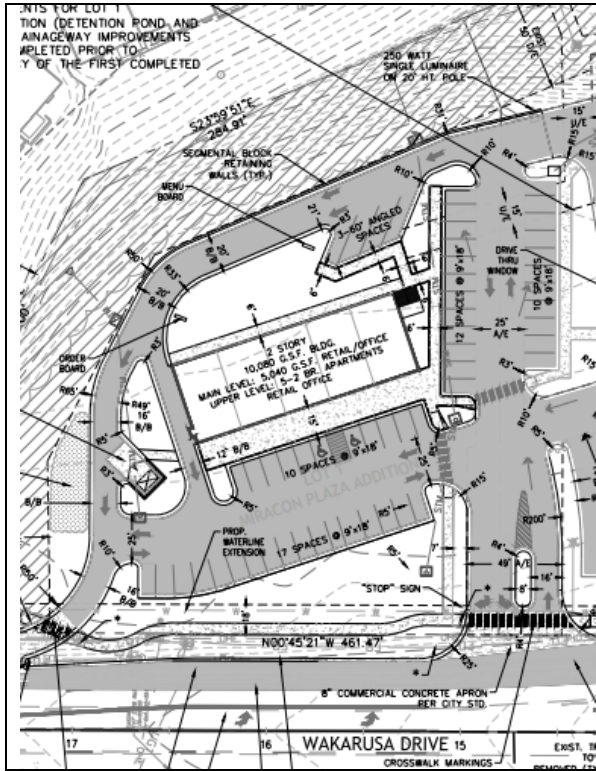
Concept plan for retail/residential use on Lot 1, the northern lot.
